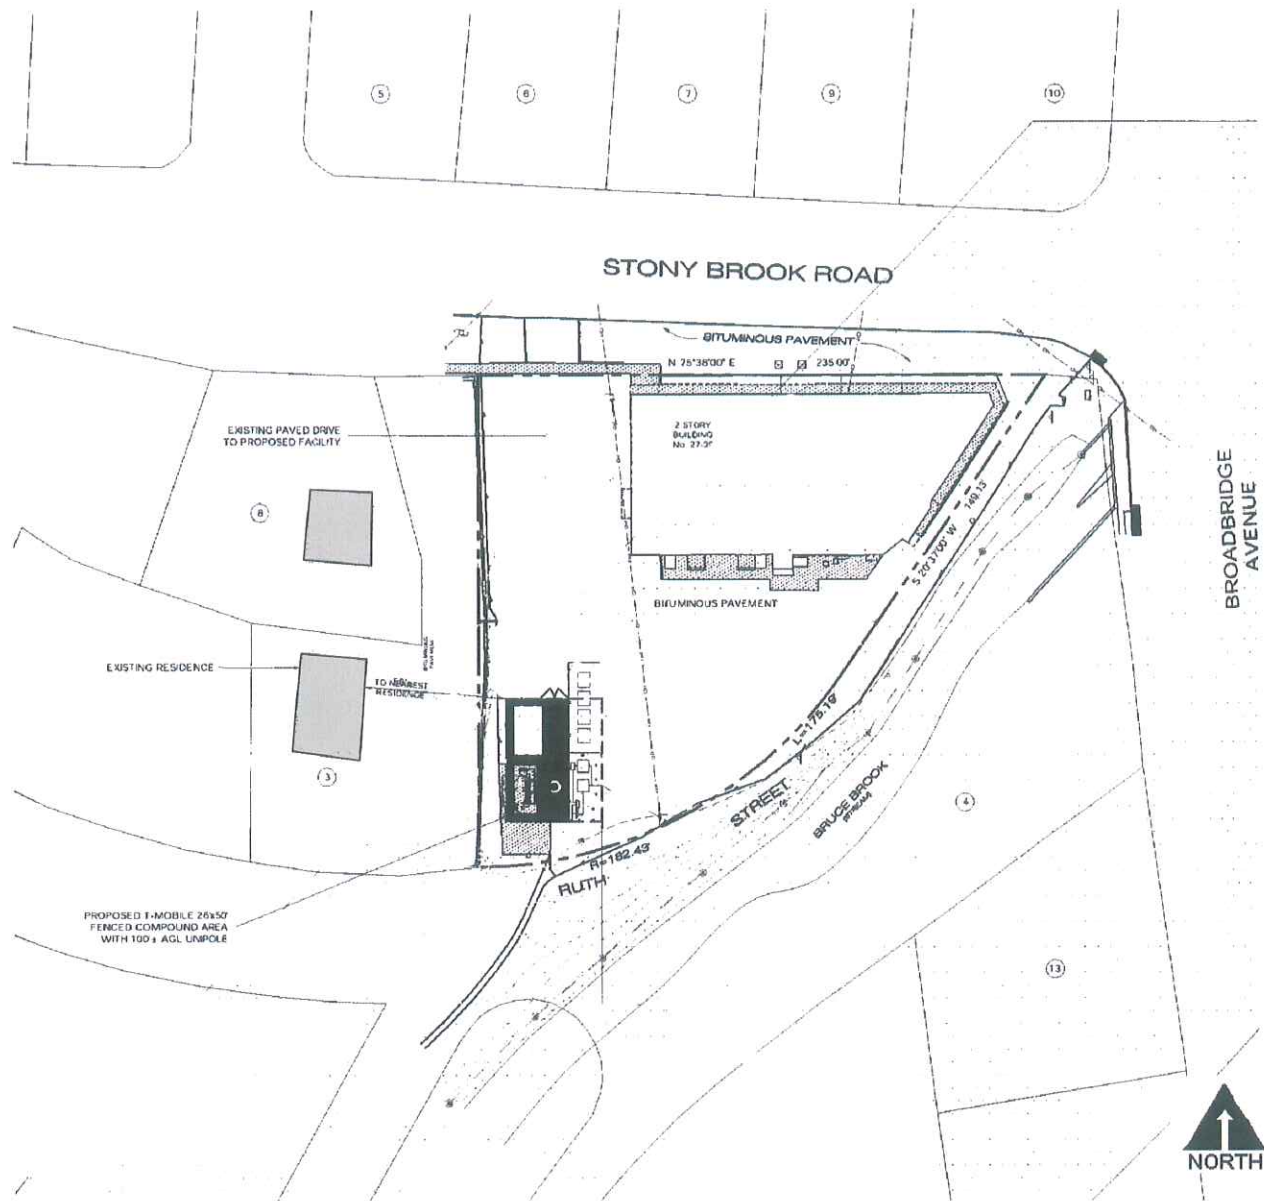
Site plan of proposed location at 23 Stonybrook Road. (T-Mobile 1, Tab B)
